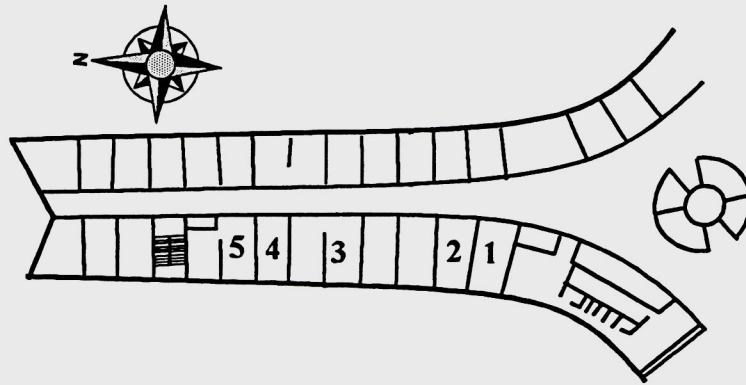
Plans of third floor of North wing, with measured office rooms (1 to 5). Special measurements were performed at location 3.
